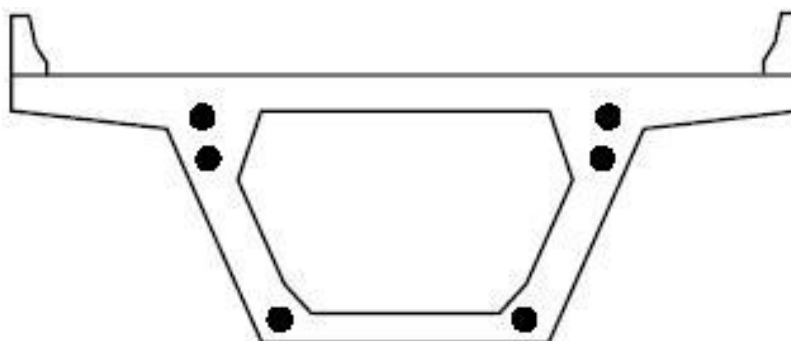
Typical Cast-in-place Box Girder Cross Section.
